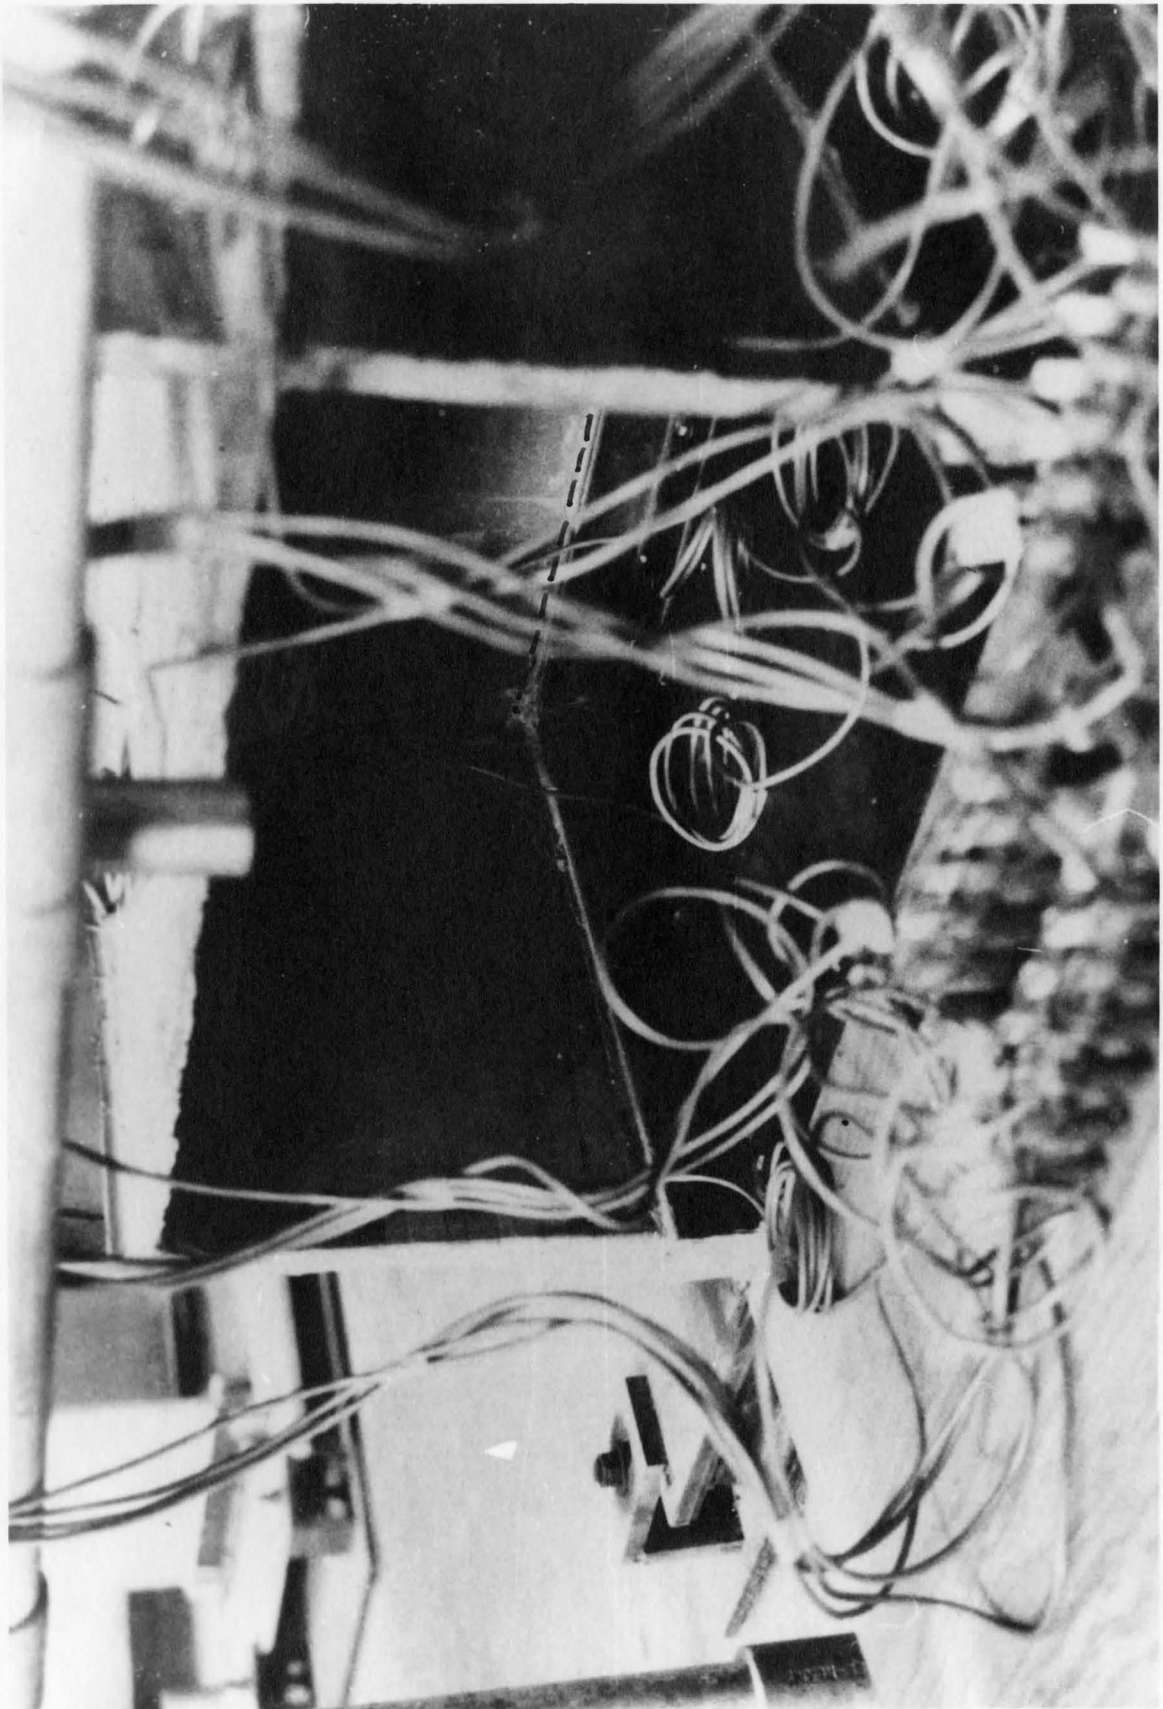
CRACKING PATTERN IN CORNER C OF BUILDING 1
